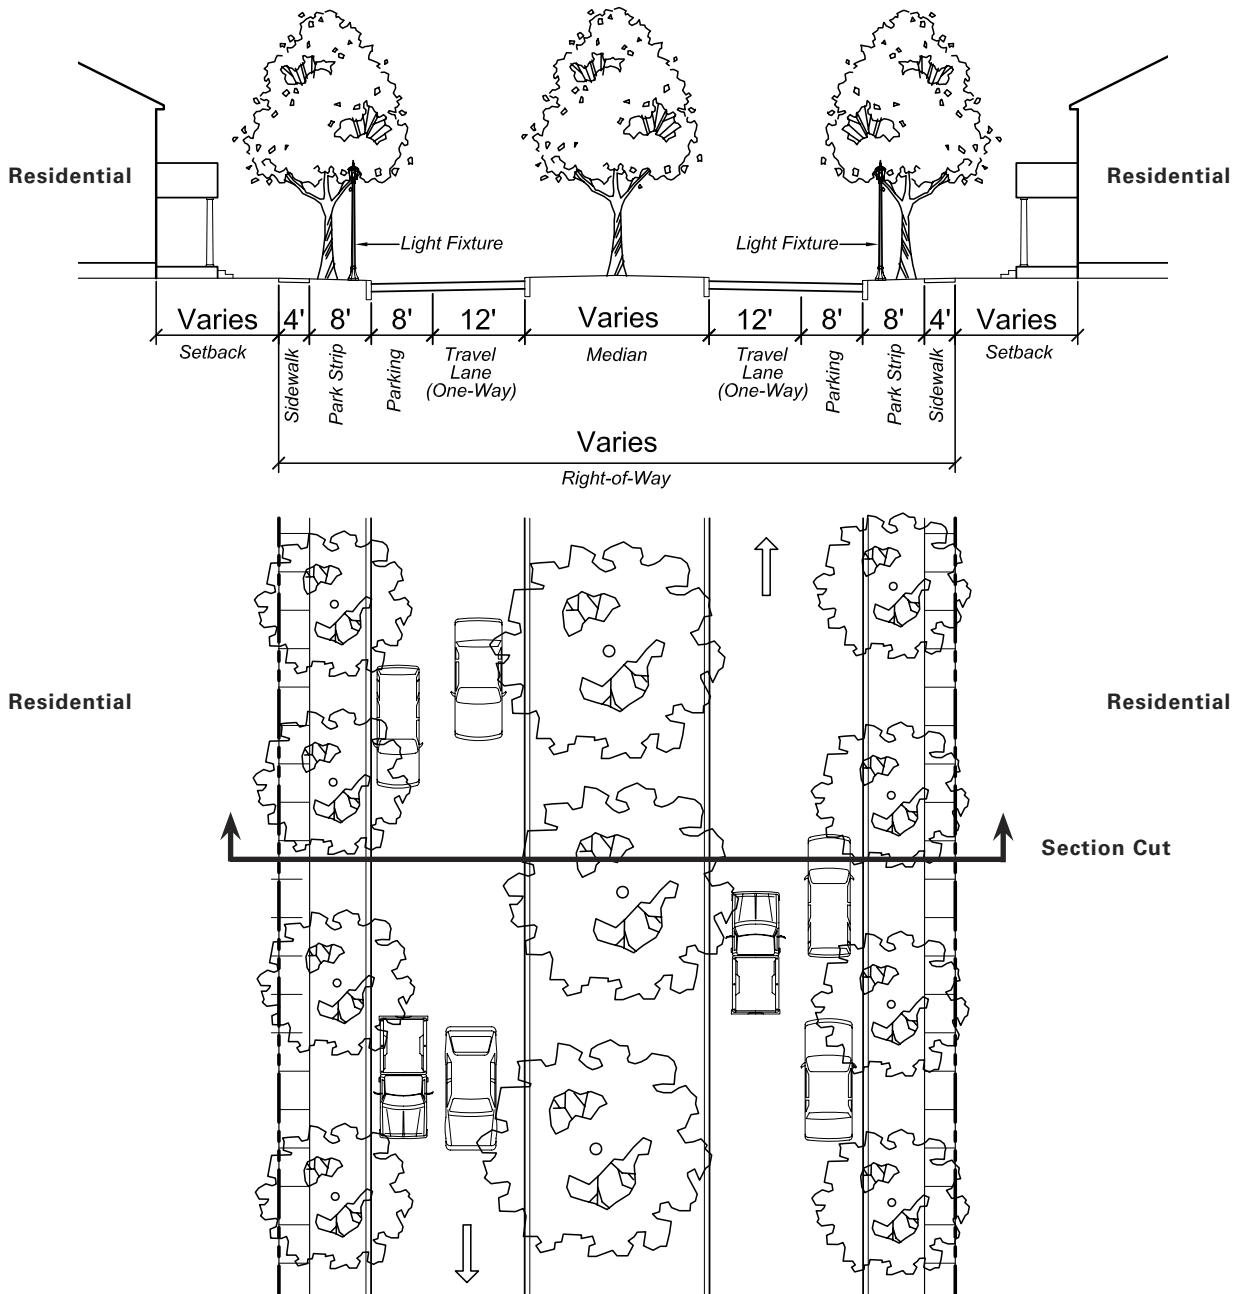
Proposed Section and Plan: Neighborhood Street D
